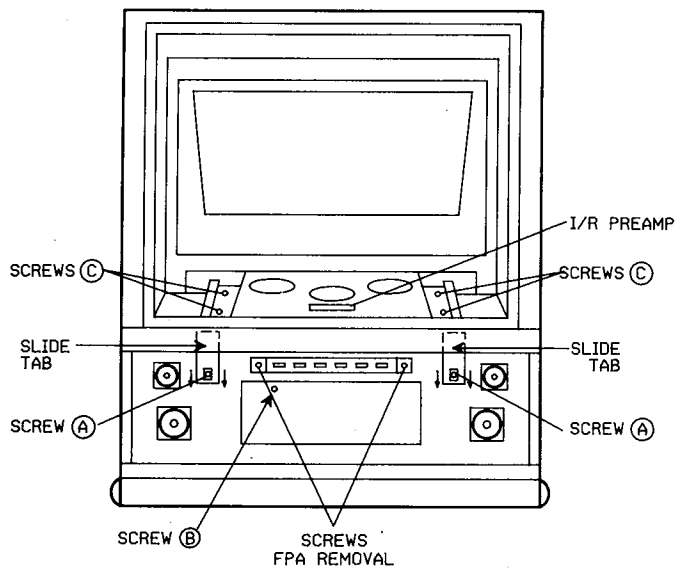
Cabinet Front View (Speaker Grille and Screen Removed) (46GW951/952, P46101/151/159, P52151)
